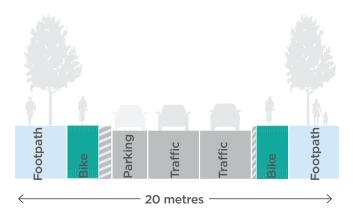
Potential typical street section for Boundary Road prior to delivery of high capacity public transport
